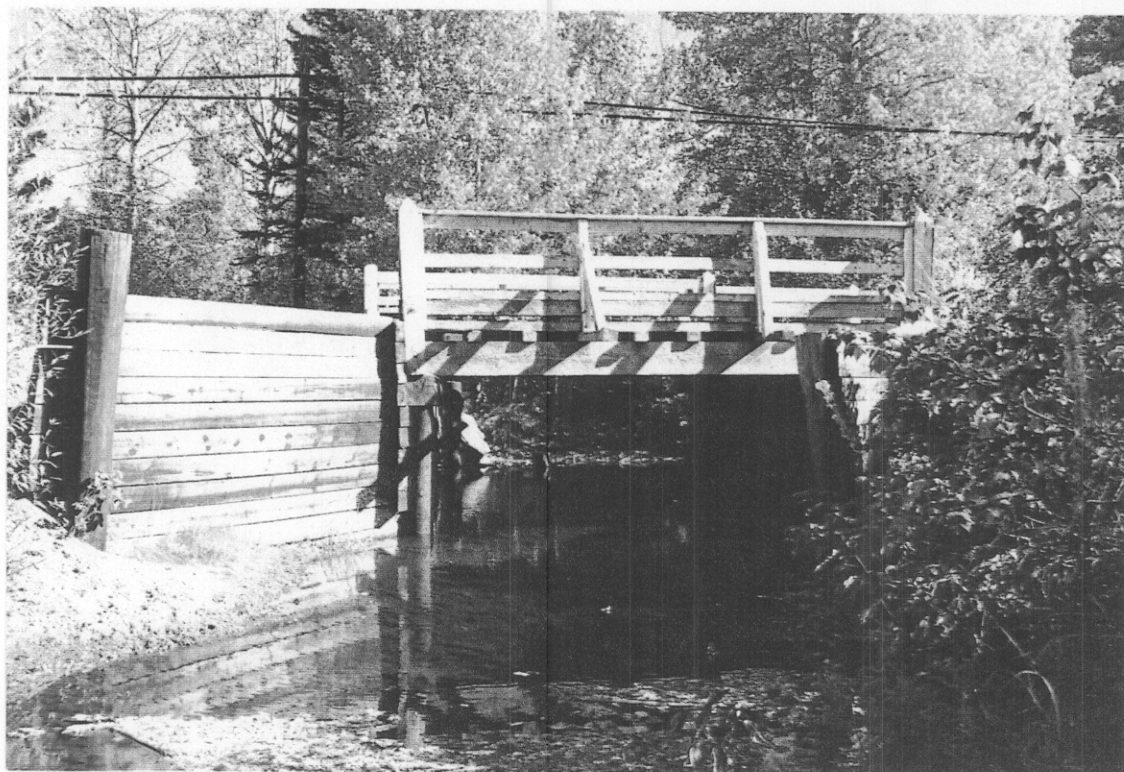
• NAHOUNLI CREEK LOOKING UPSTREAM AT DOUGLAS AVENUE BRIDGE (SECTION 9)
